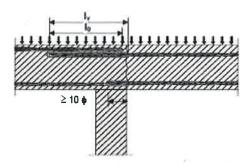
Overlap joint for rebar connections of slabs and beams
